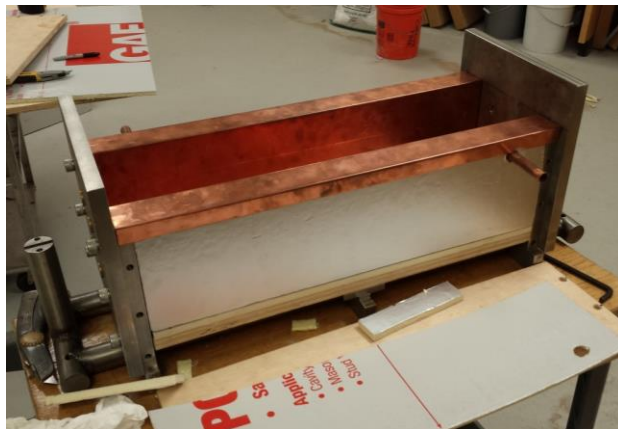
Copper sheet form work in place on the free shrinkage frame after the 1/2 inch tubing was installed
